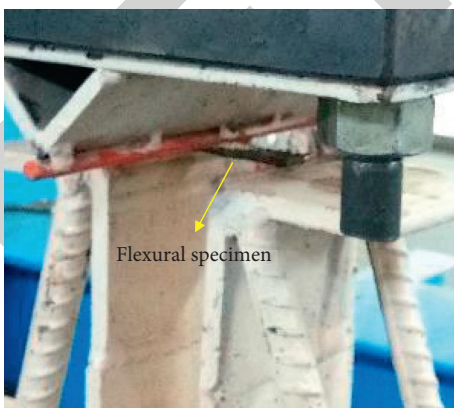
Three-point loading for testing of BFRP flexure specimens.
